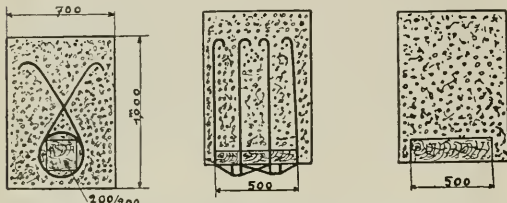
DISTRIBUTION OF WOOD REINFORCING ELEMENTS IN CONCRETE BEAMS RECOMMENDED BY AN AUSTRIAN COMMISSION
